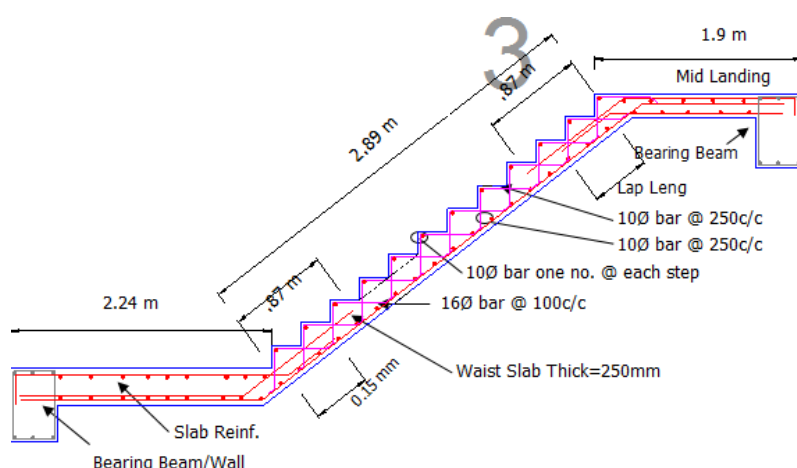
Details of Reinforcement for a Typical Flight Between El.986.87 m and El.985.31 m
